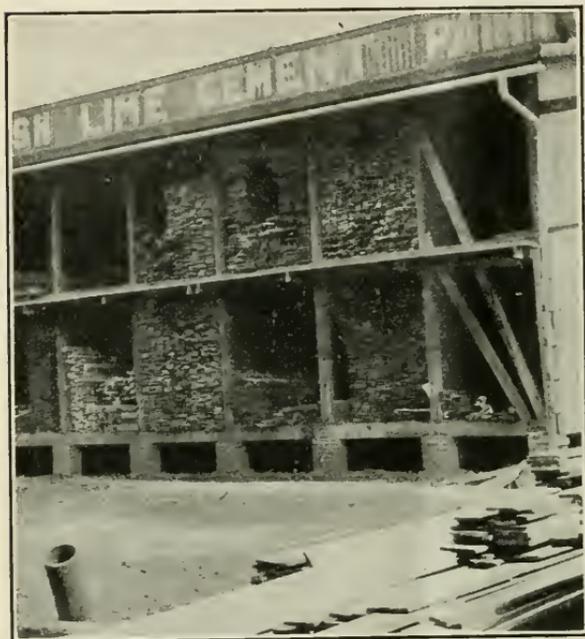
A retail shed in Tennessee, well roofed, provided with gutters, and set on brick piers with ample ventilation beneath from all sides.
